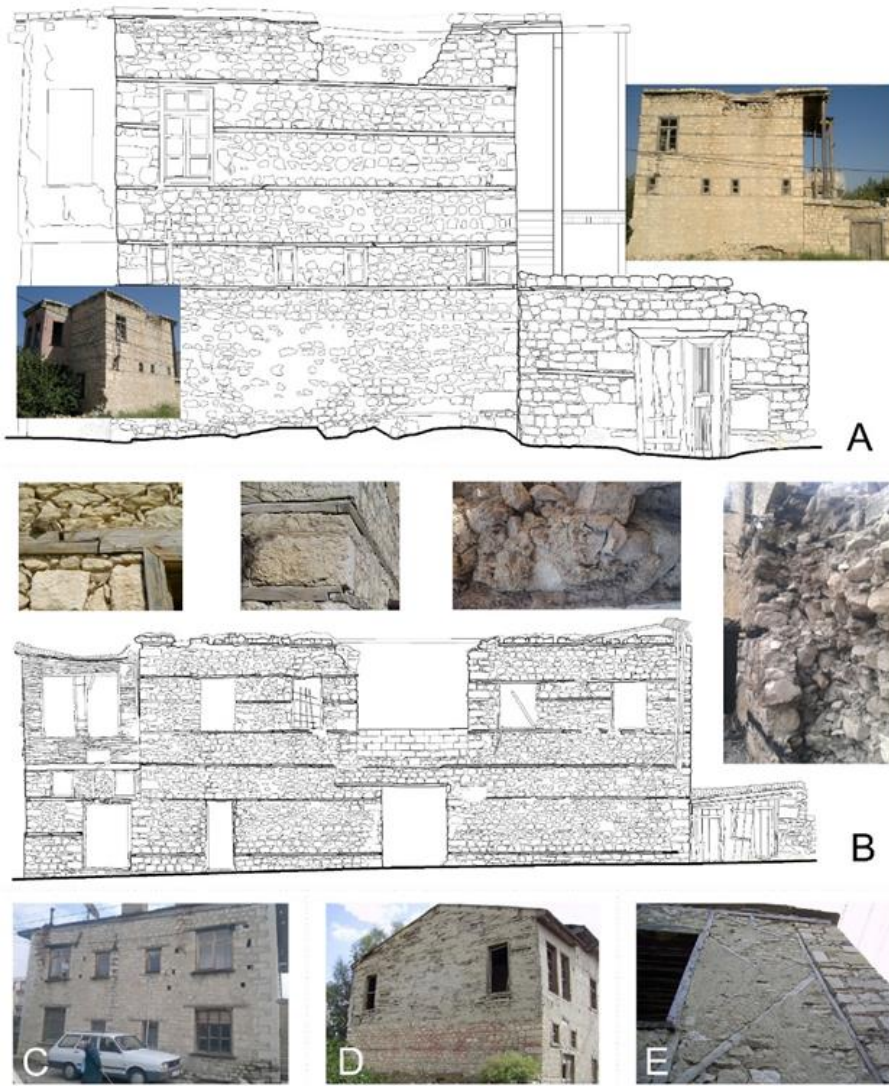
Examples of stone masonry wall with timber bond beams and details: Northwest façade of Hacer Şişik House (A), South façade of Ali Manav House and details (B), Examples of Stone masonry without timber bond beam (C), Timber framed-unfilled-timber lathed (bağdadi) (D), Timber framed-infilled (hımış) (E)
